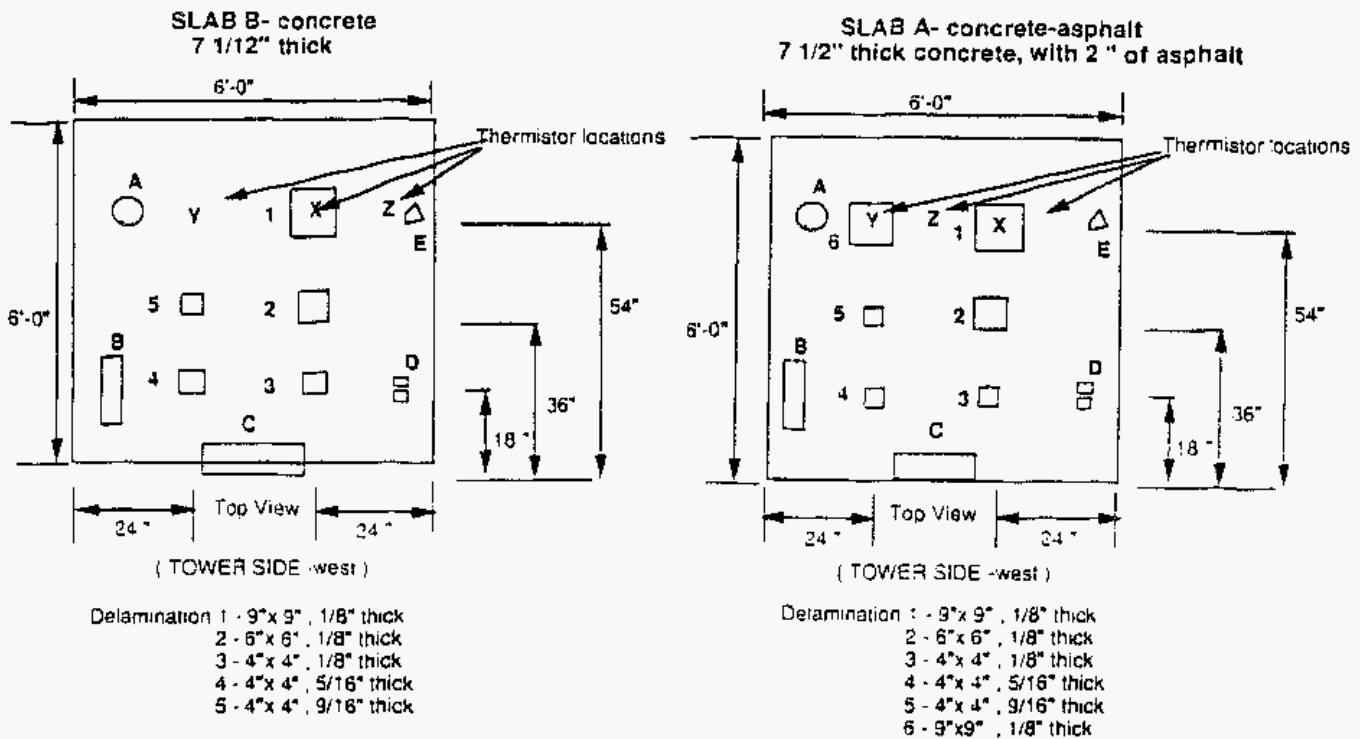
Diagram of concrete slabs used to measure the effects of subsurface delamination sites for a concrete bridge deck.
